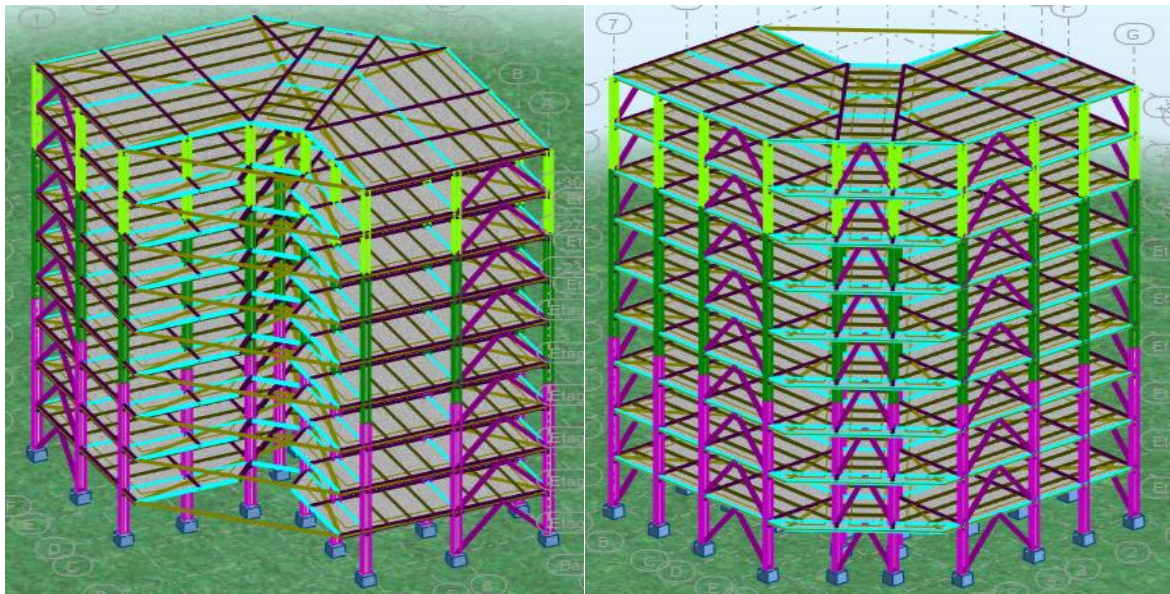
Final model of the structure, the building is reinforced by the bracing system.
